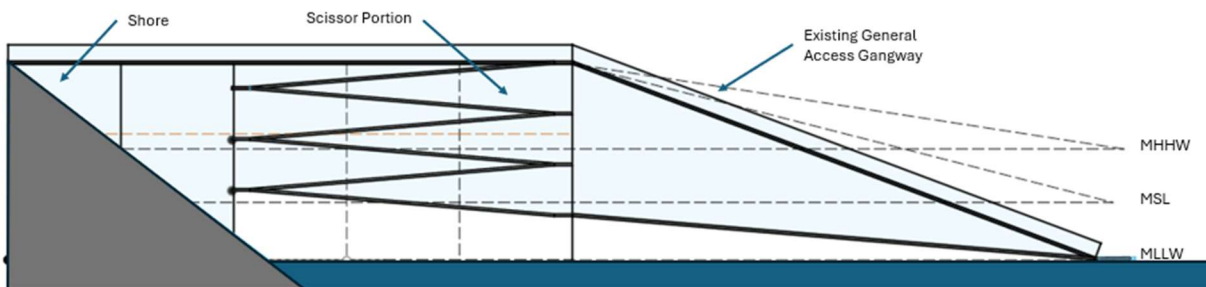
Switchback ramp add on alongside the existing gangway, shown at low tide.
